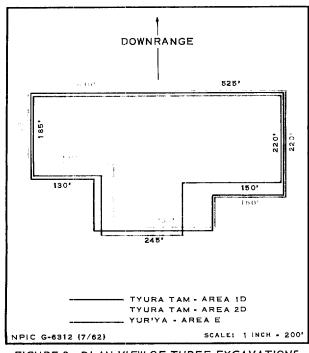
PLAN VIEW OF THREE EXCAVATIONS.
